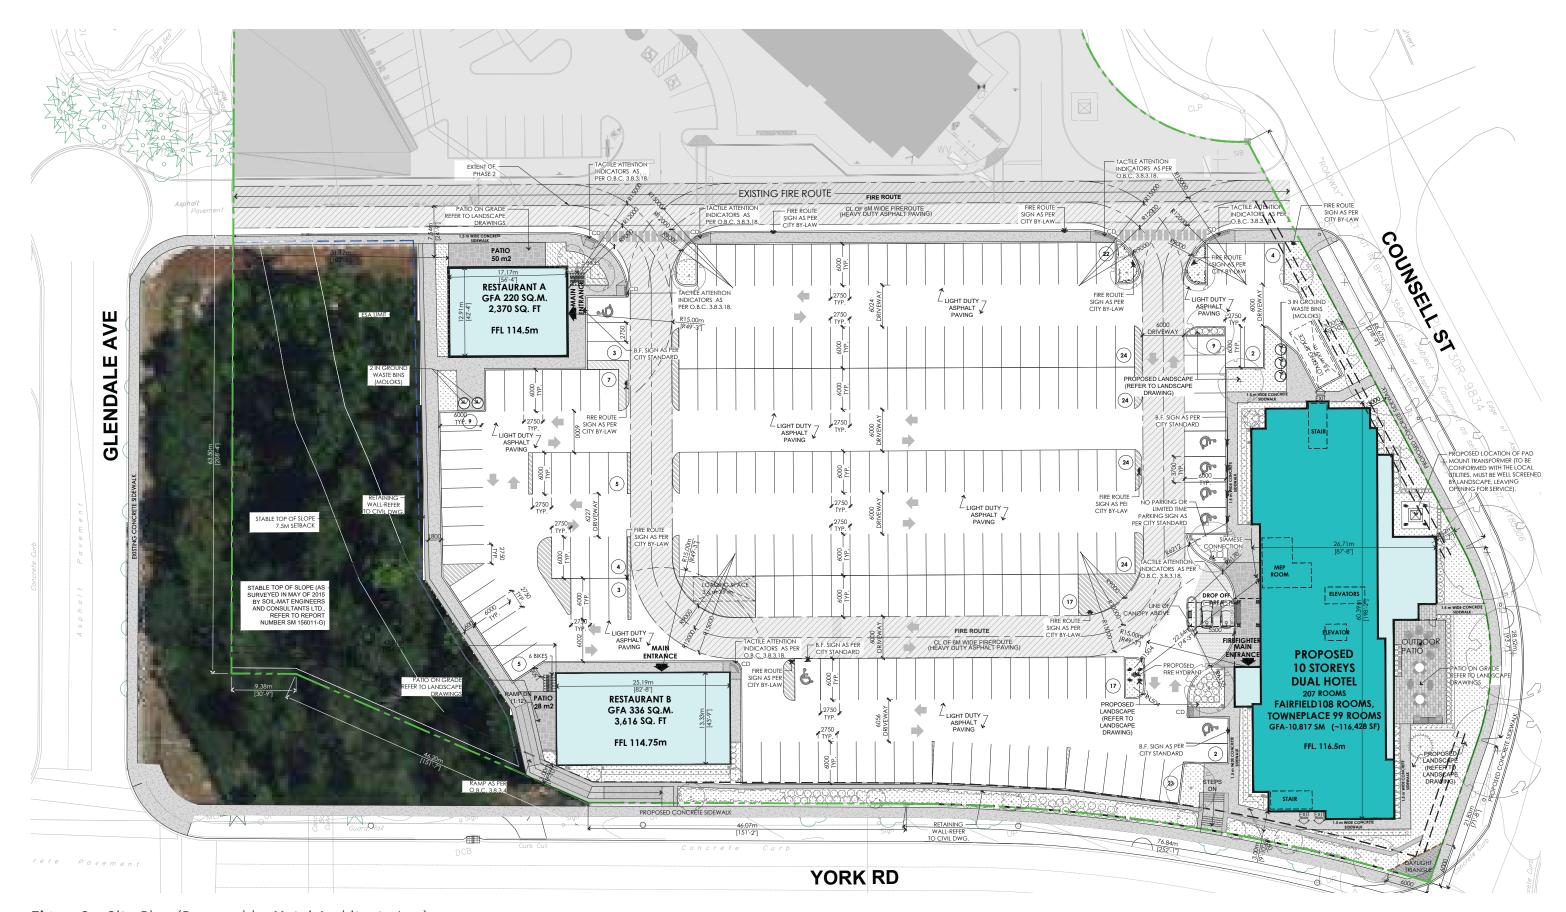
Site Plan (Prepared by Mataj Architects Inc.)
